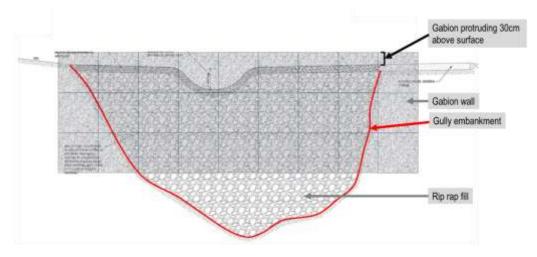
Schematic⁴ suggesting the installation of transverse gabion walls in the erosion gully.
